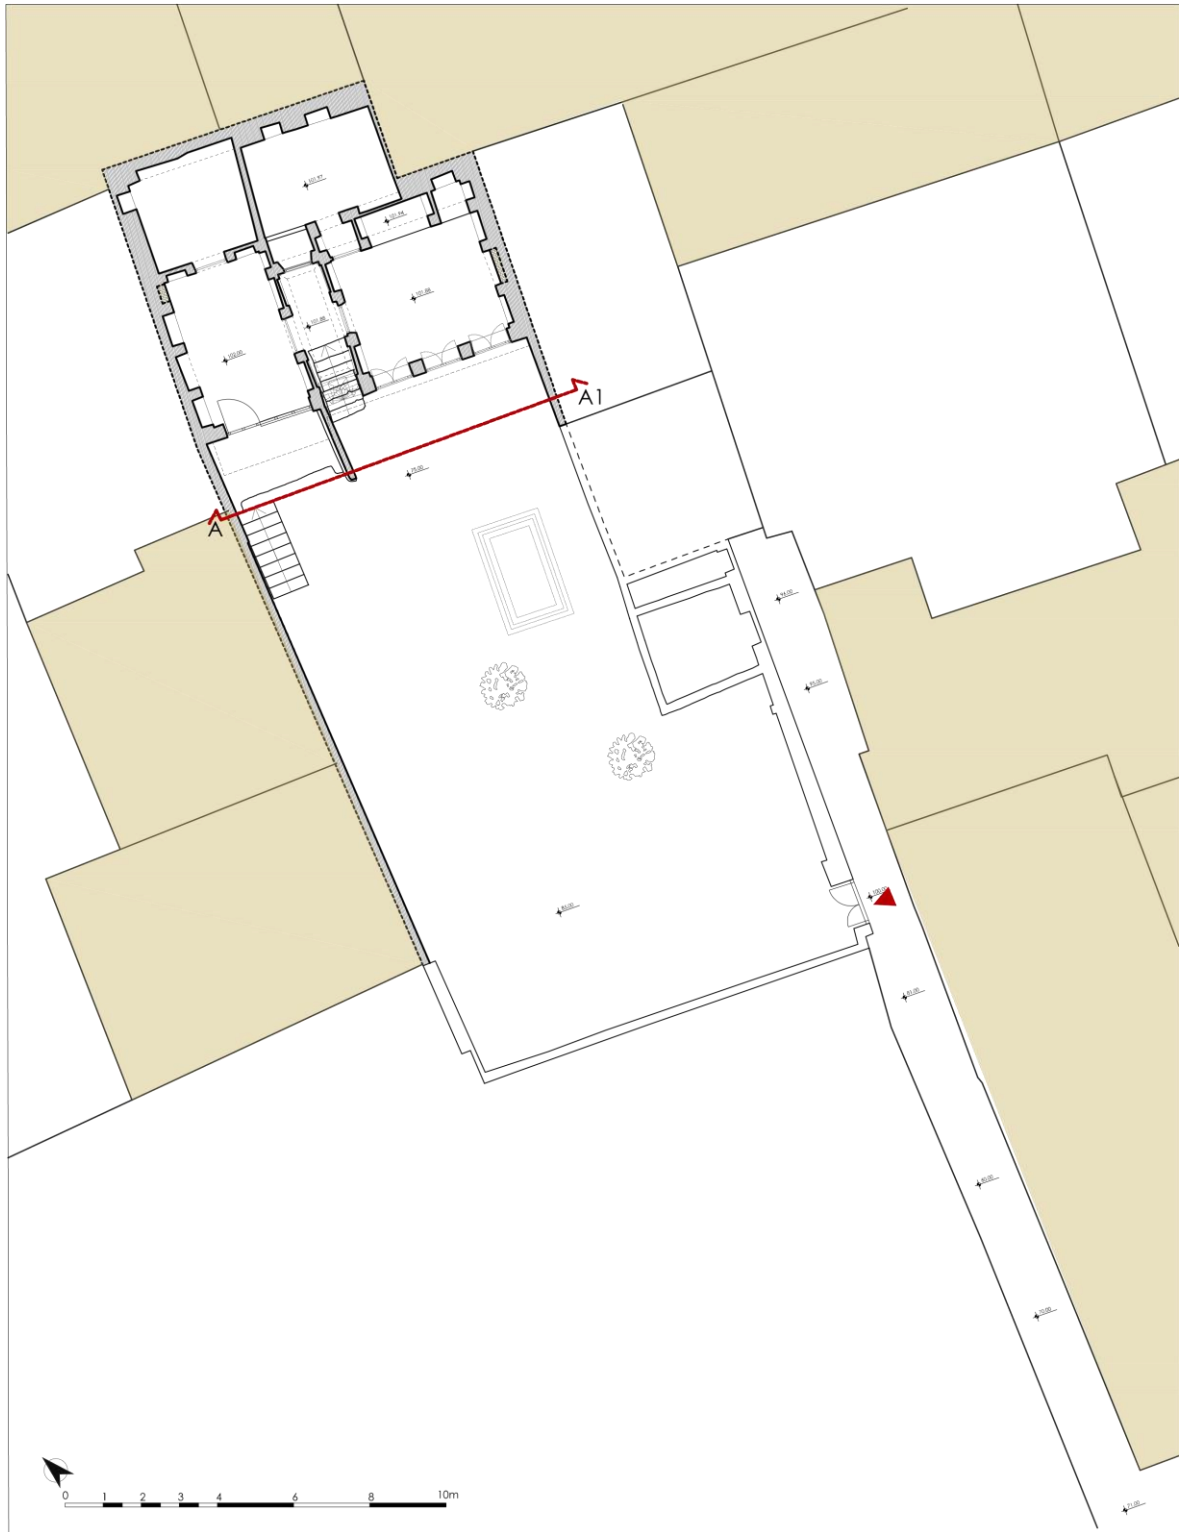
The first floor of north eastern building mass in which family and guest zone are located.
